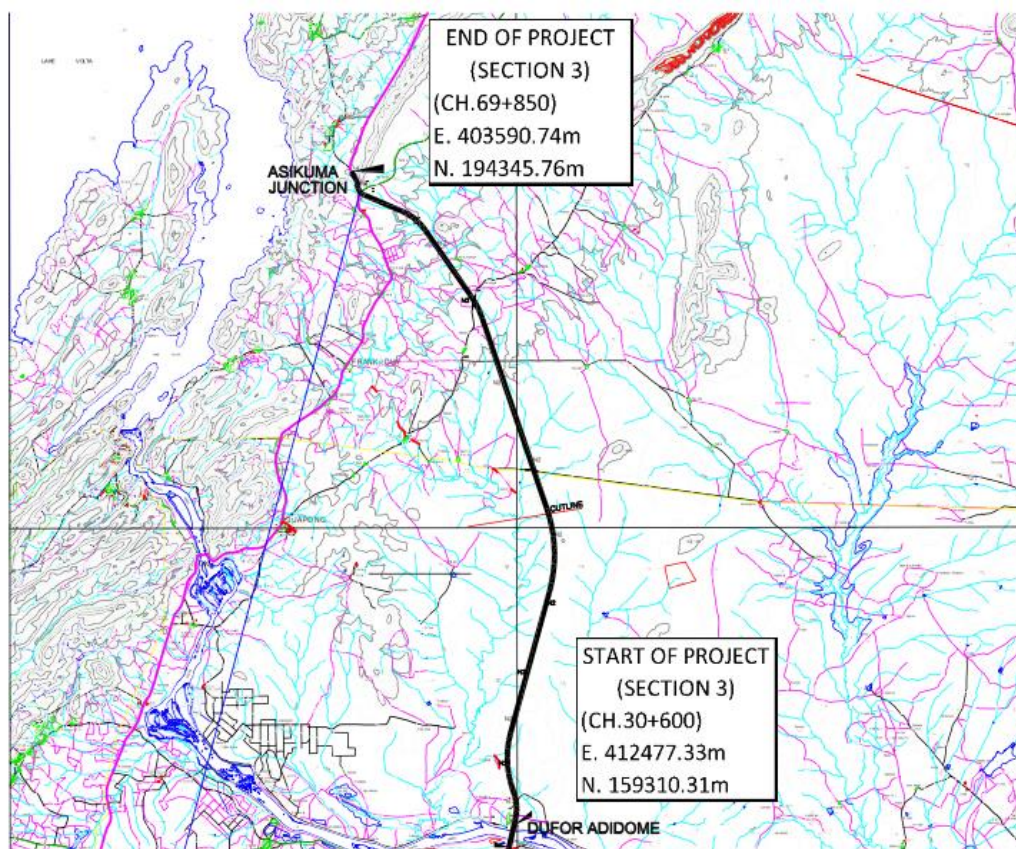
Final Alignments for Sections 1 and 3 Project Roads
